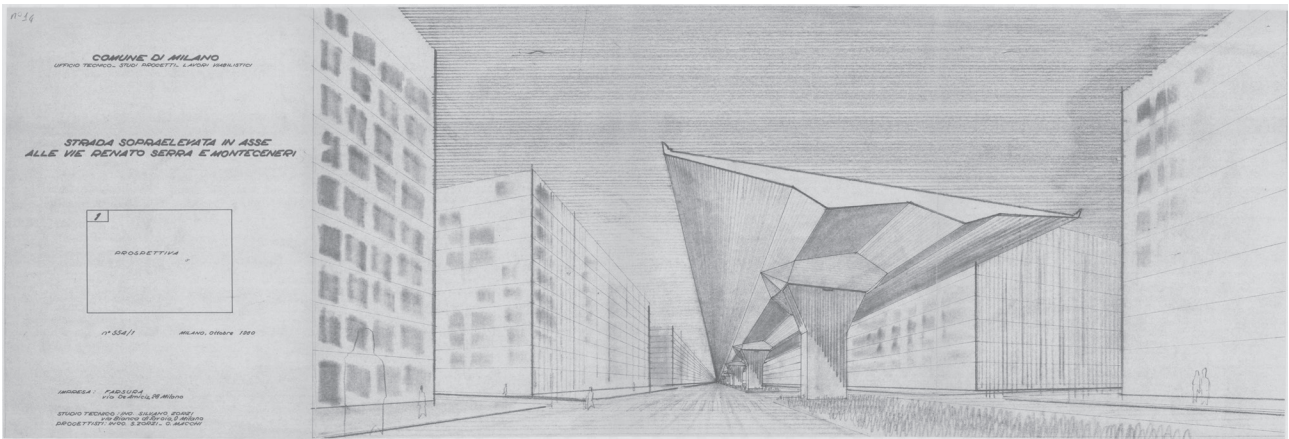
Elevated road along viale Renato Serra and viale Monte Ceneri, working drawings. Perspective view (Municipal Archive of Milan, Technical Infrastructure Department, Milan).
